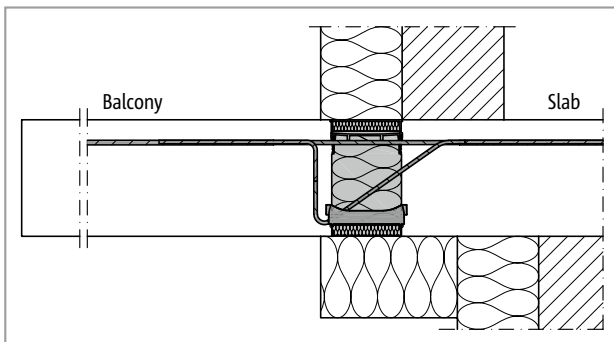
Schöck Isokorb® XT type K: Connection for indirectly positioned floor and TICS
